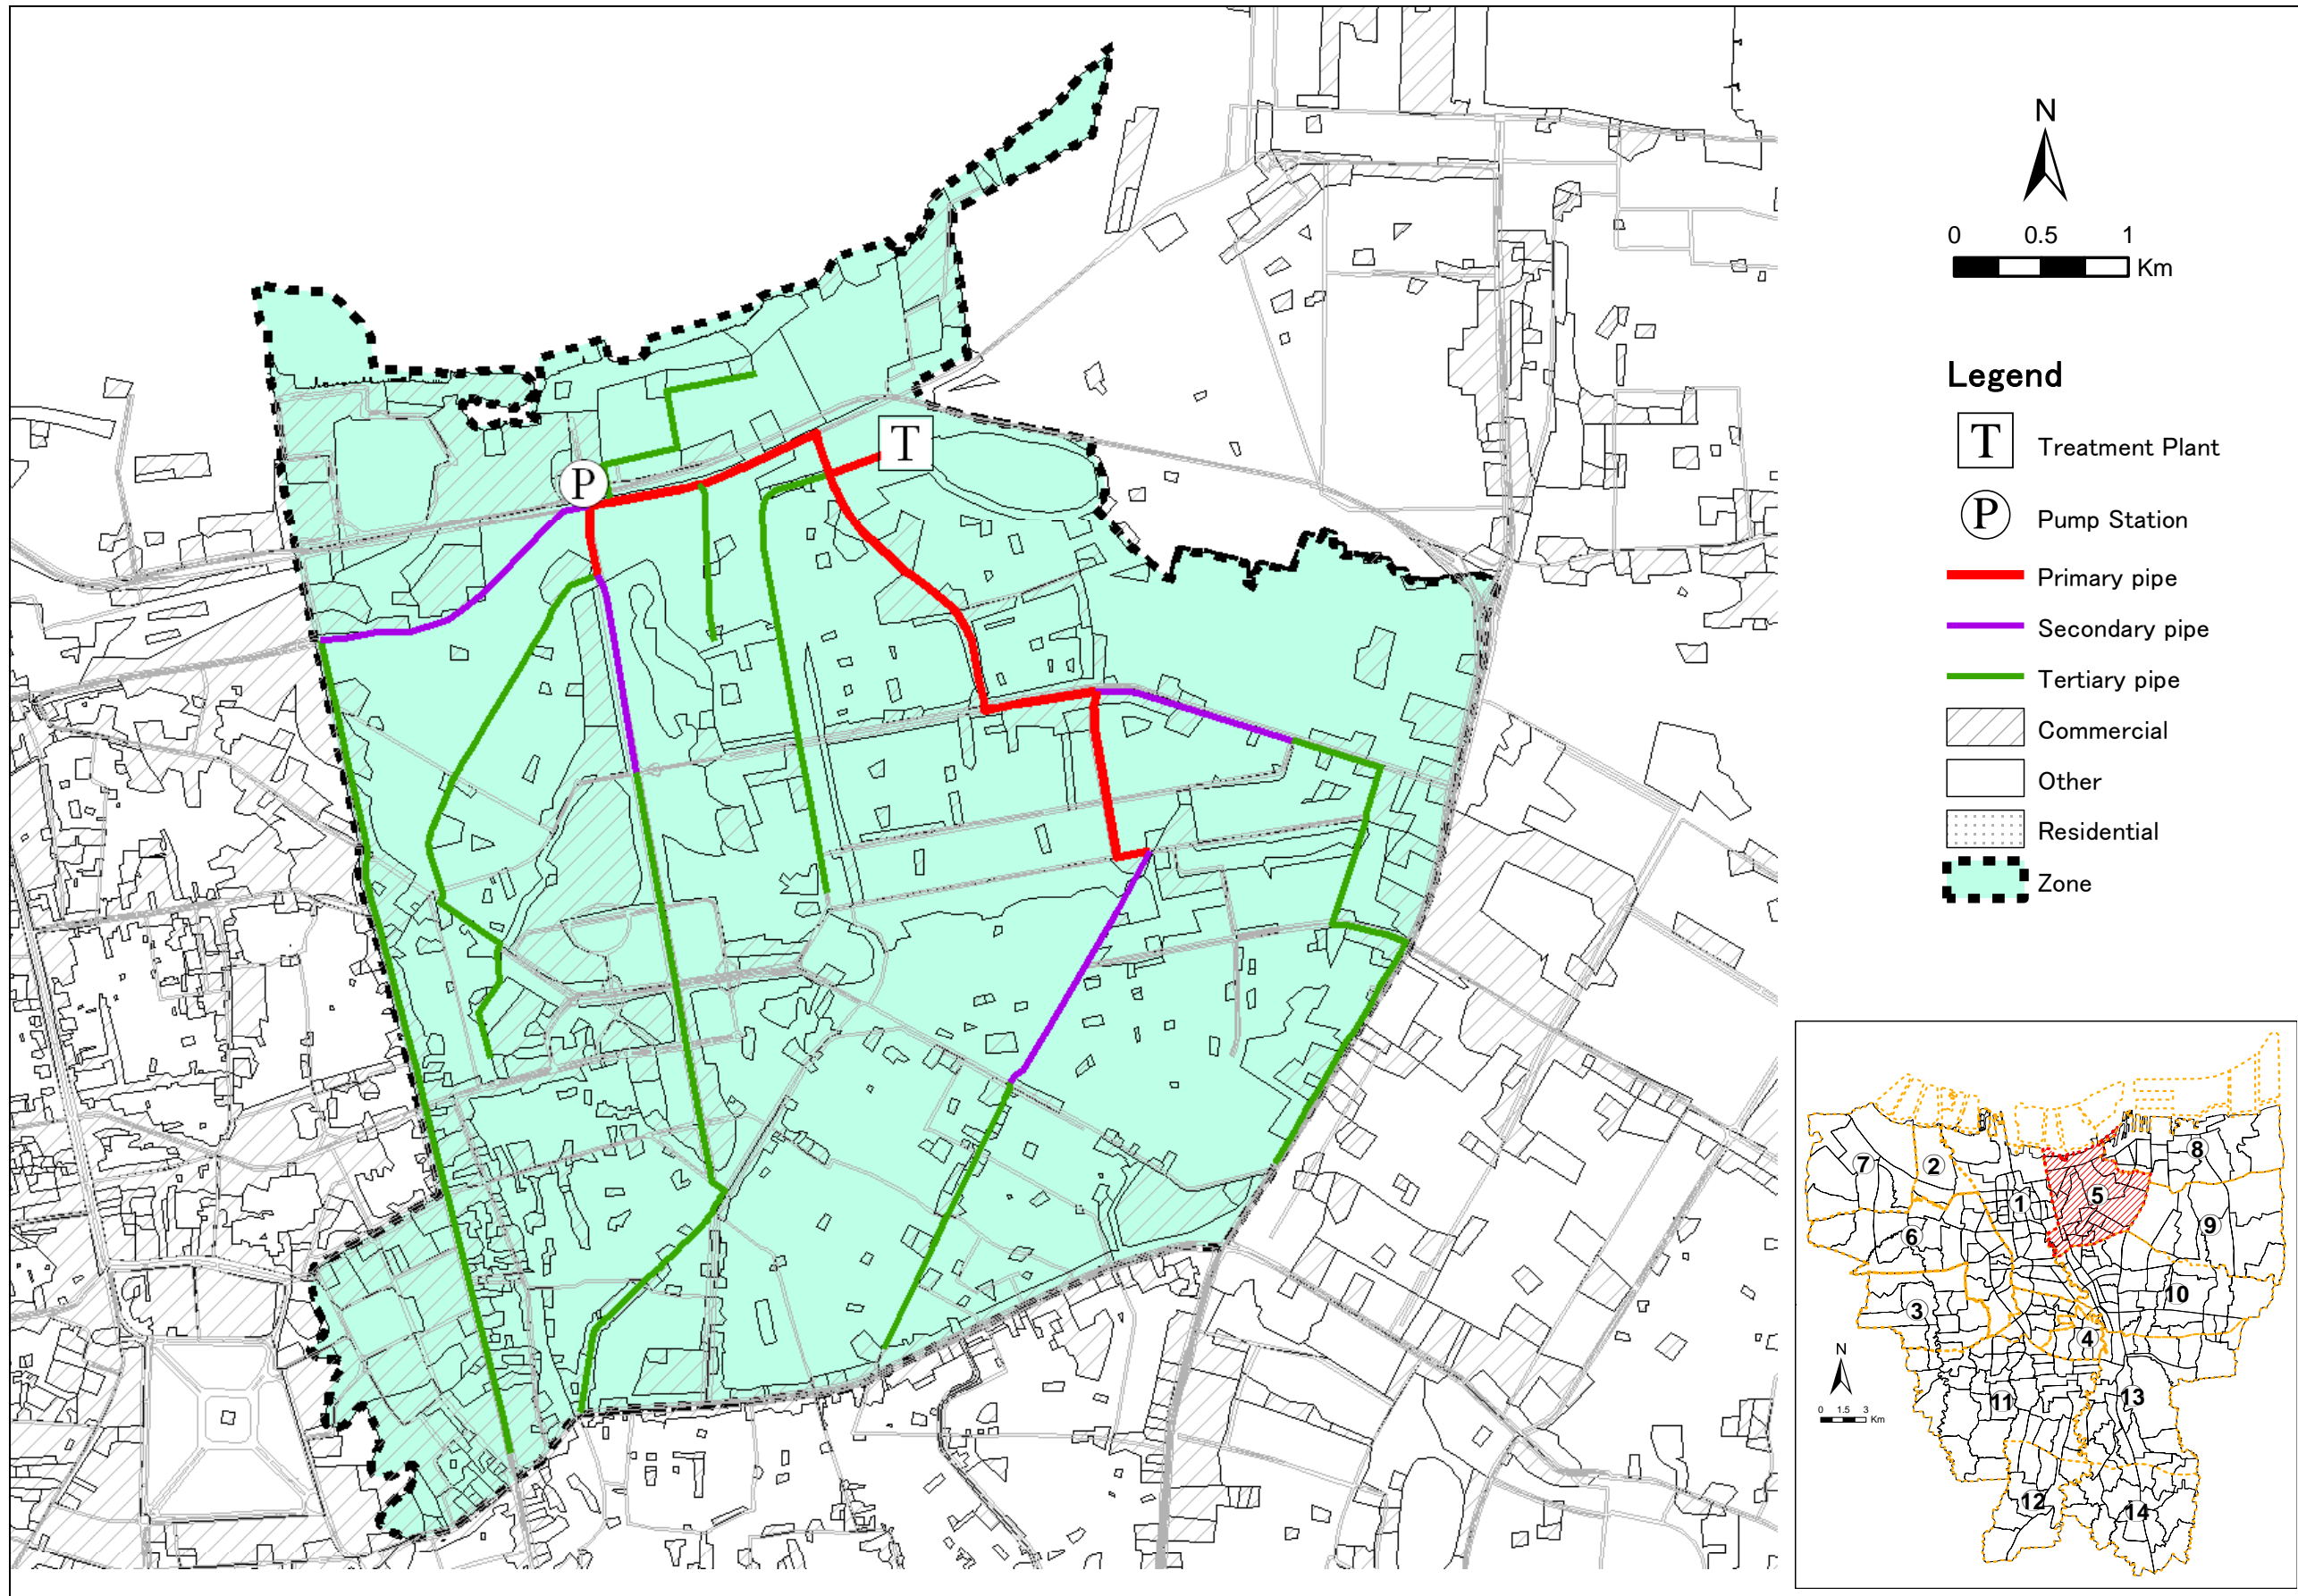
Main Sewerage Facility Plan in Sewerage Zone No. 3
